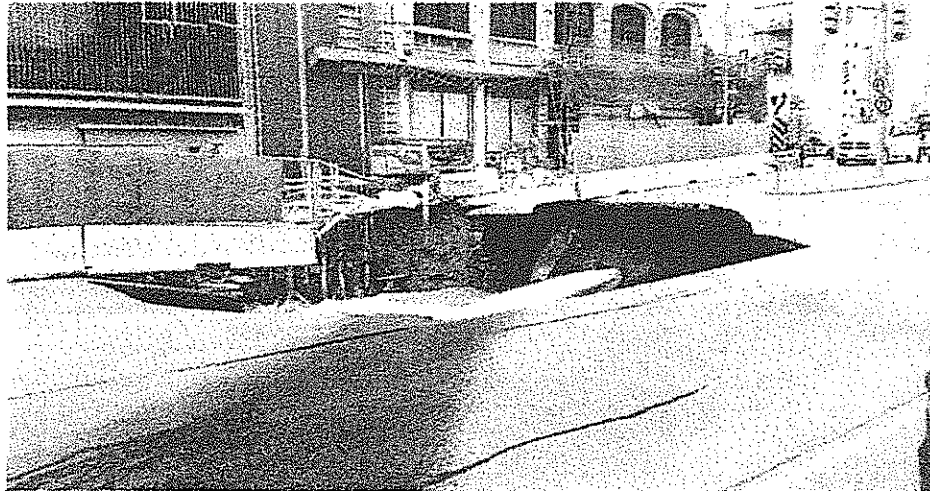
Sinkhole on Rideau St. Looking SW at 10 Rideau St.
